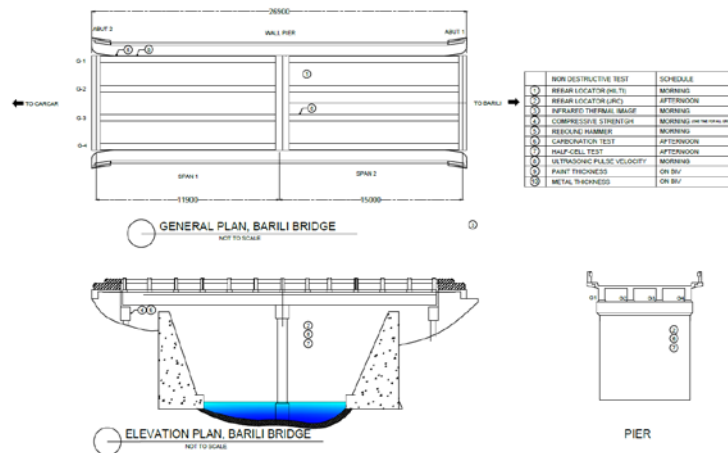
Test Point Location Plan (Visayas Area)
